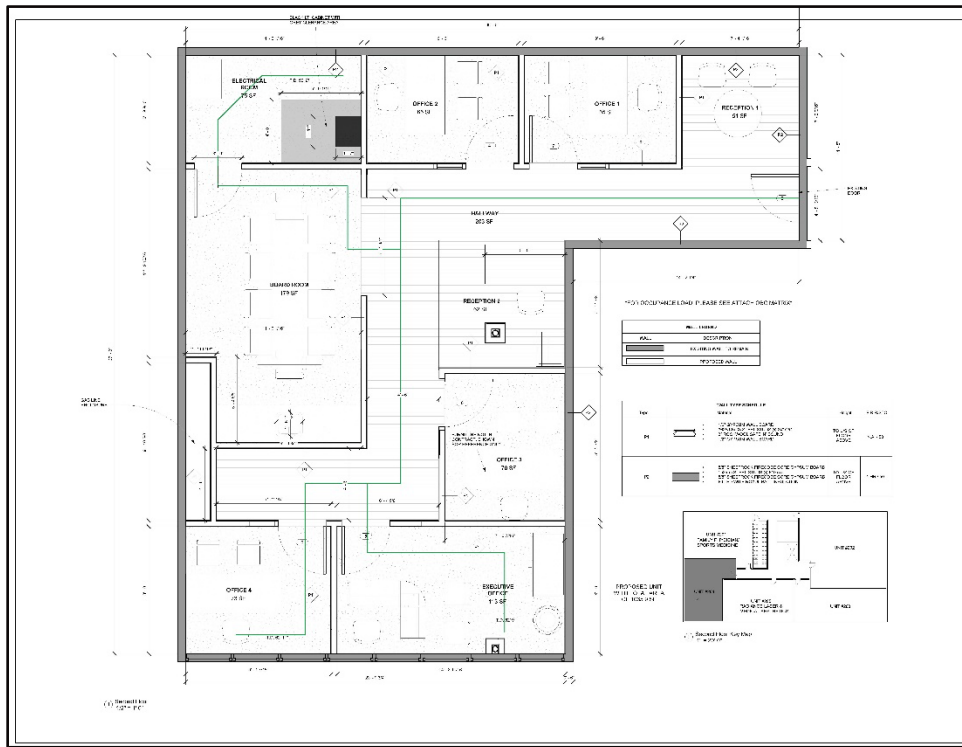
Second Floor Plan (Source: Paulsan Construction Inc. - Drawings)
